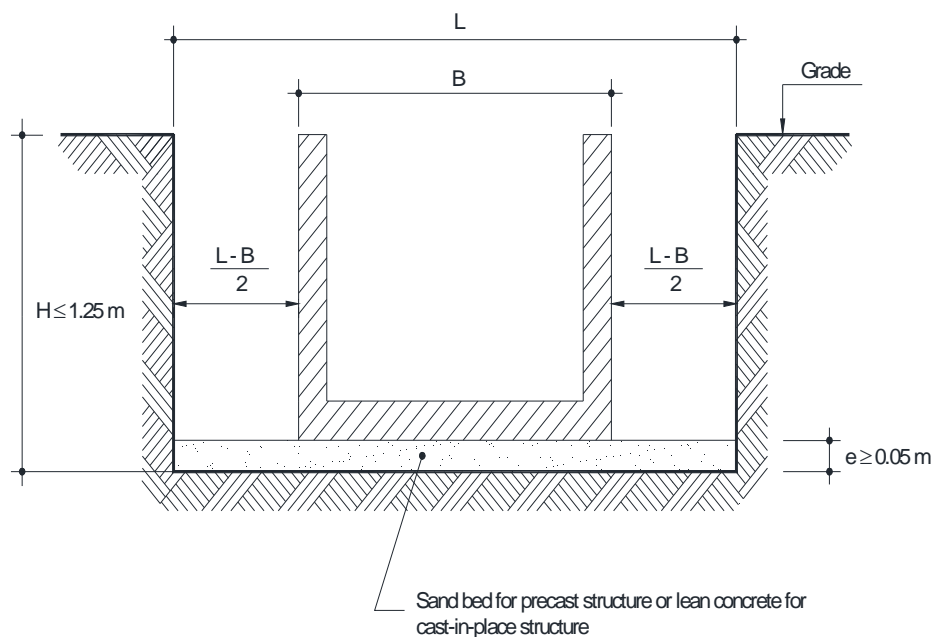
Excavation Boxes For Installation Of Drainage At A Depth Up To 1.25 M
